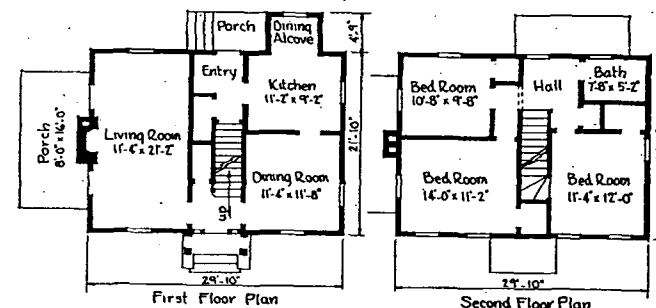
FLOOR PLAN OF SIX-ROOM RESIDENCE
